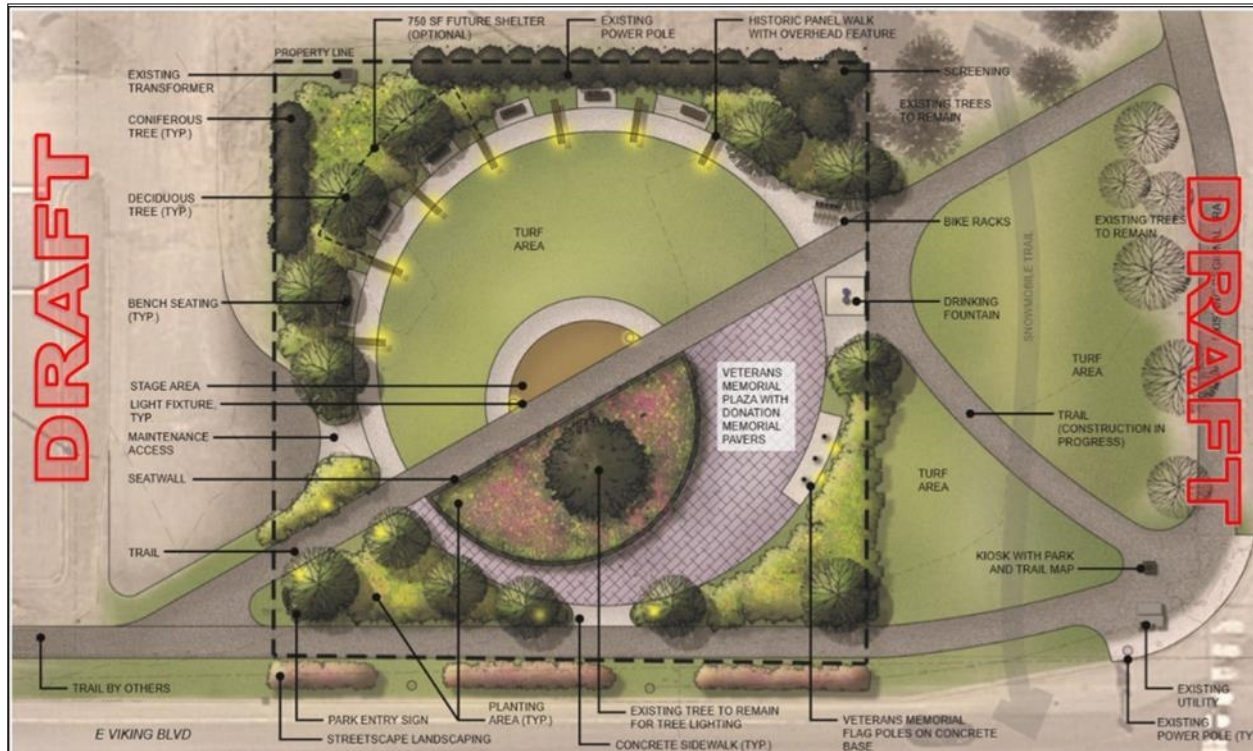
Concept Plan for Future Enhancements to Railroad Park
